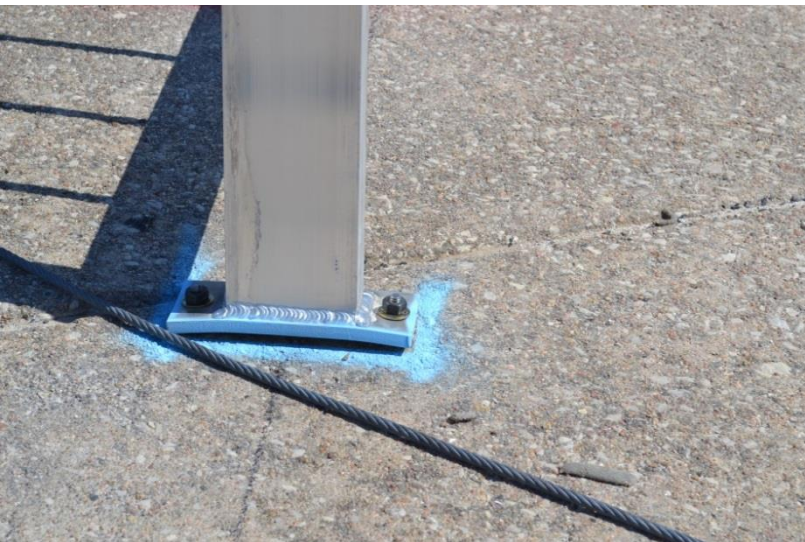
First Panel Damage, Run No. WIPR-1, Test No. WIPR-1-1
